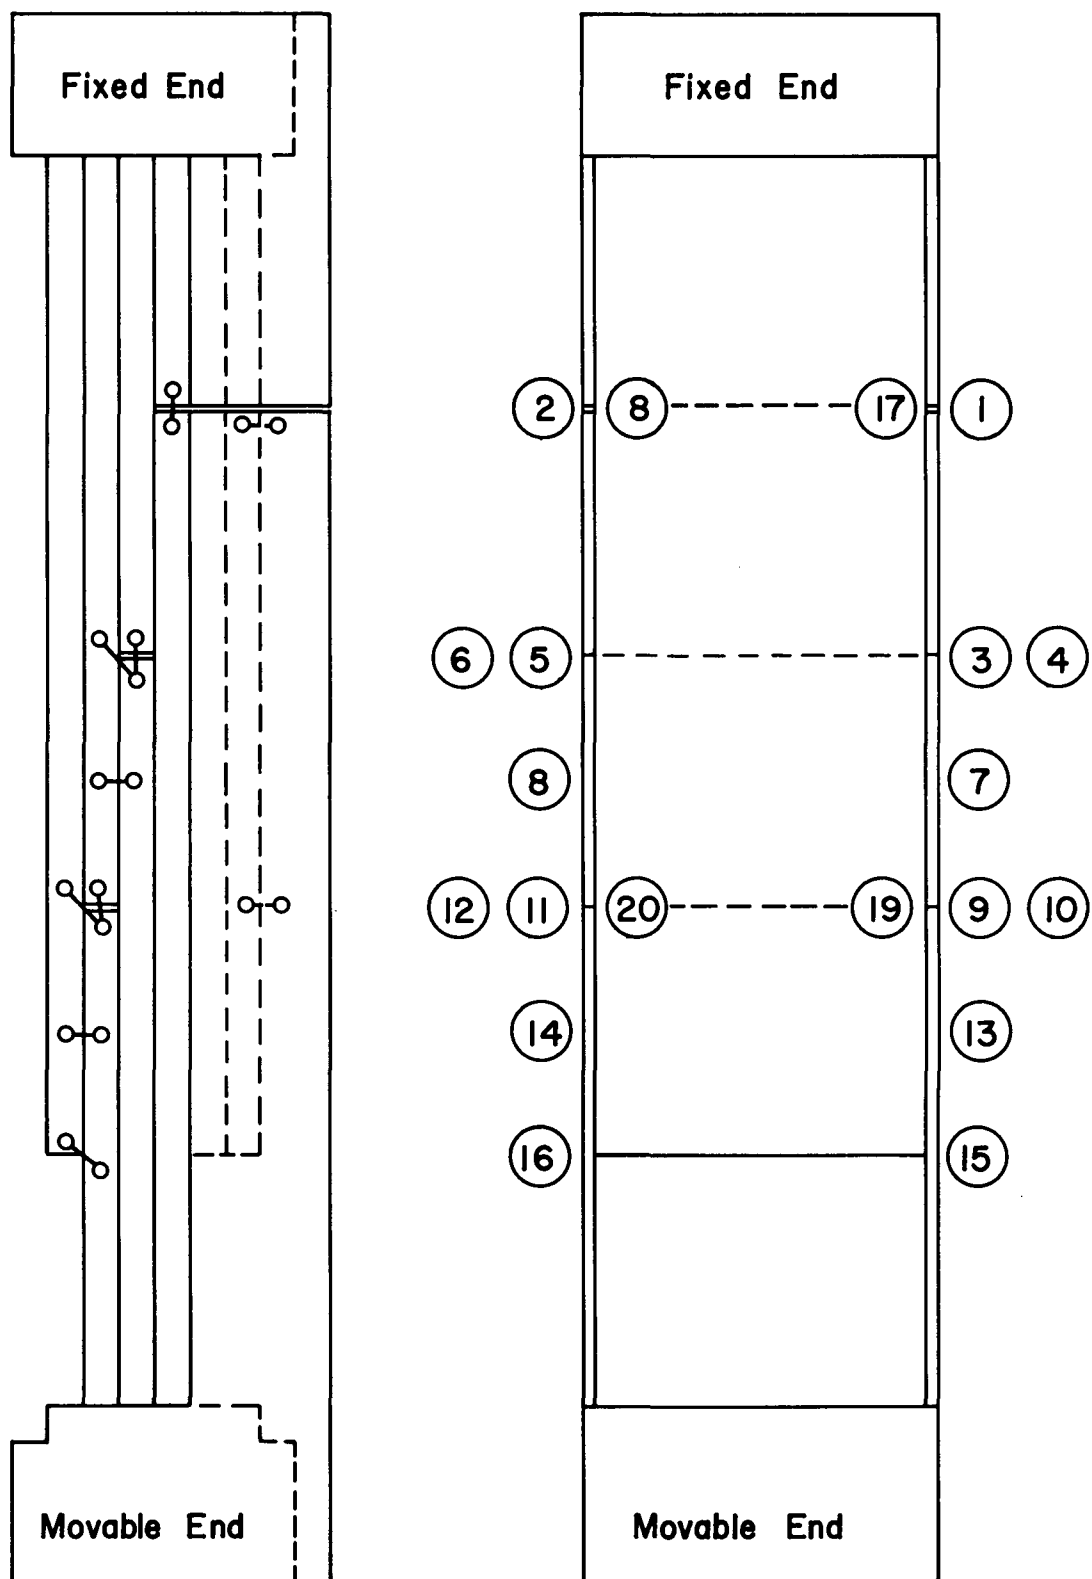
Location of Local Slip Measuring for Riveted Joint
